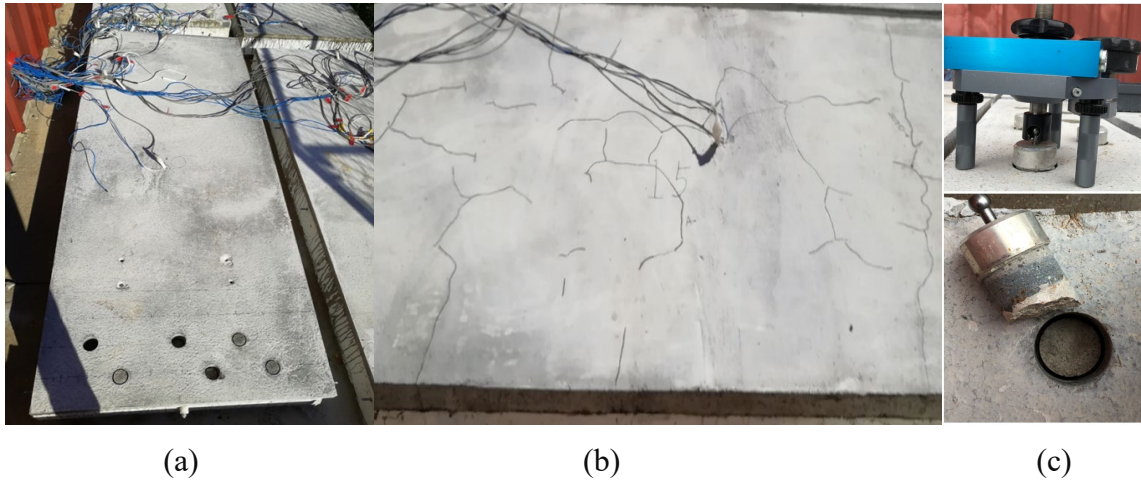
(a) Overview of overlay slab specimens, (b) cracking of slab specimens repaired with UHPC overlay, and (c) direct tensile pull-off bond test
